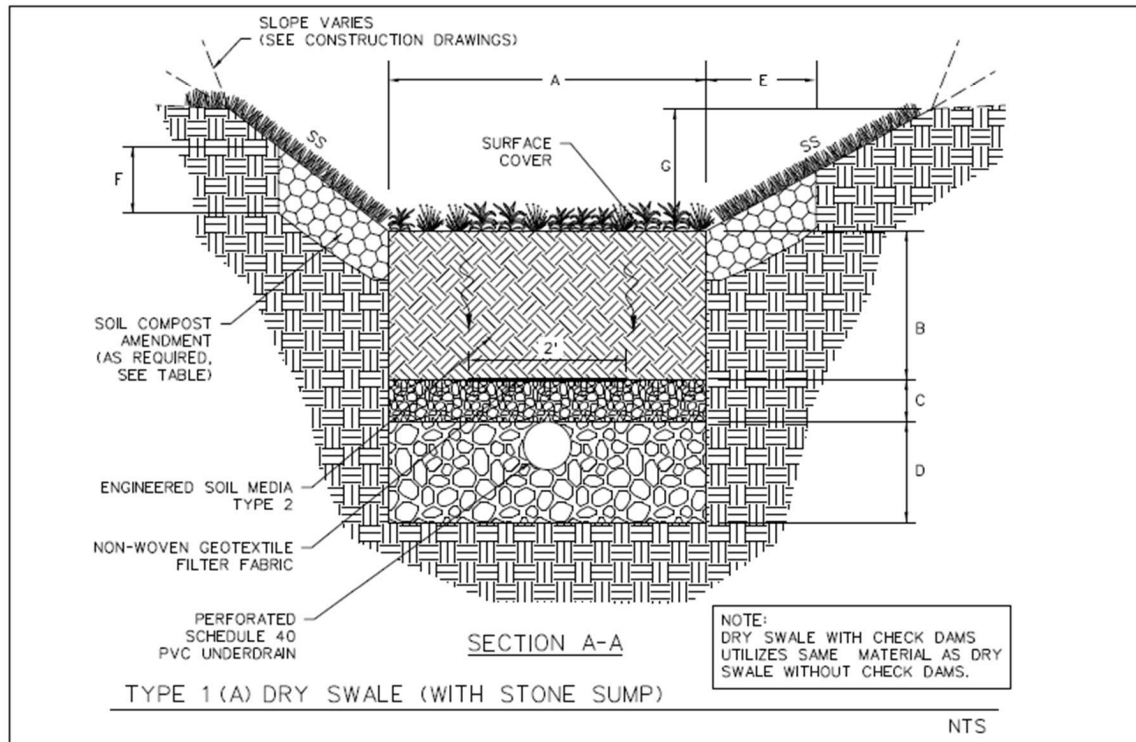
Typical Dry Swale – Level 2 [Cross-section View]
